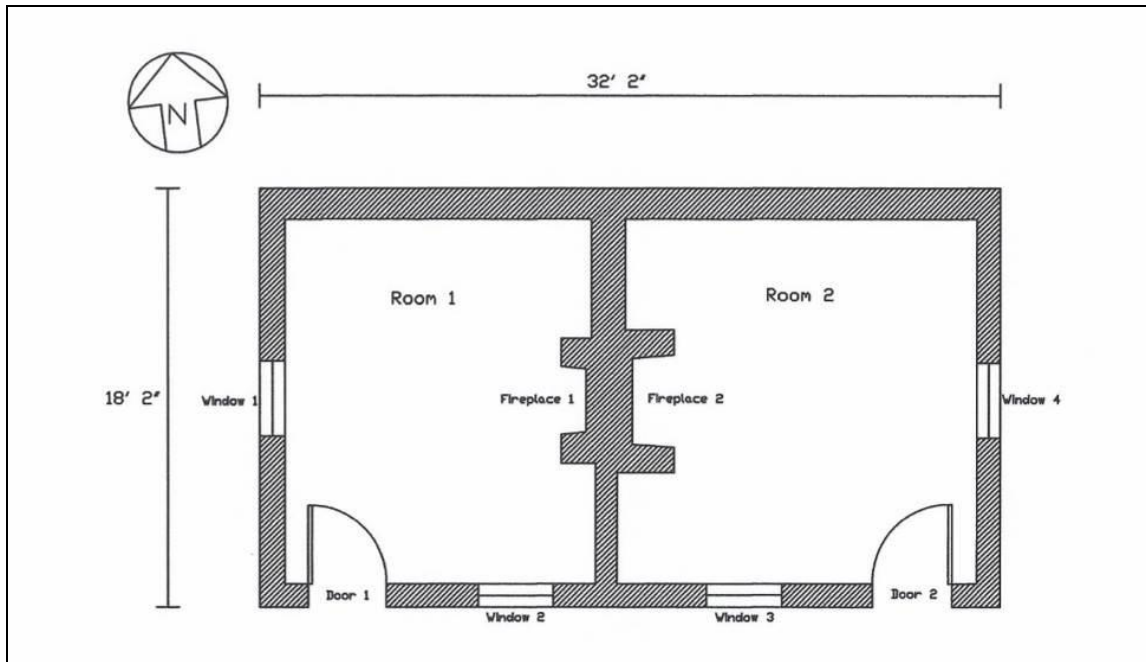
Phillips House Slave Duplex, Detailed First Floor Plan.
